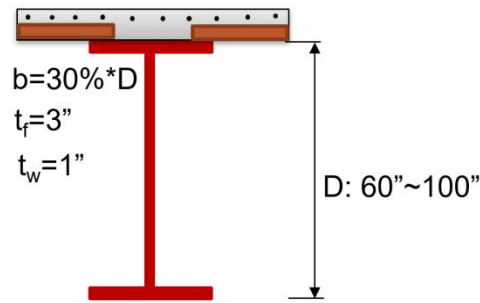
10 Cross-section Utilized in the Steel Girder Analytical Studies
